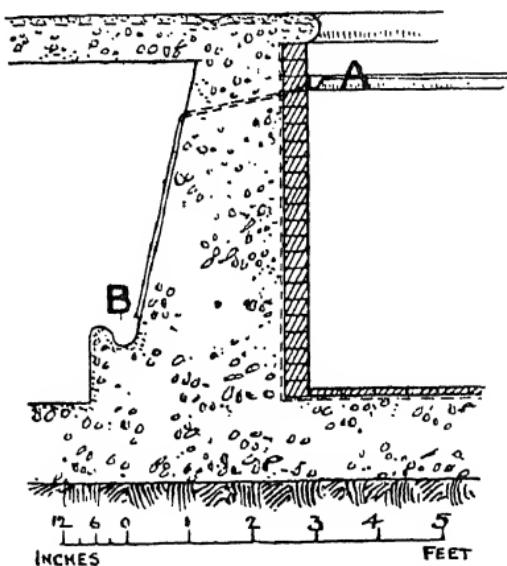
Section through Wall and Floor of Swimming-bath.
